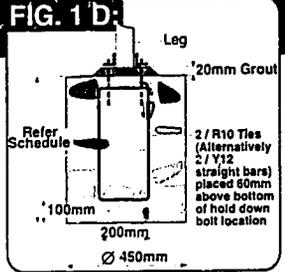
, c & d are NOT to be used in New Zealand conditions refer to SLAB AND FOUNDATION SCHEDULE attached to plans, for detailed drawings.
